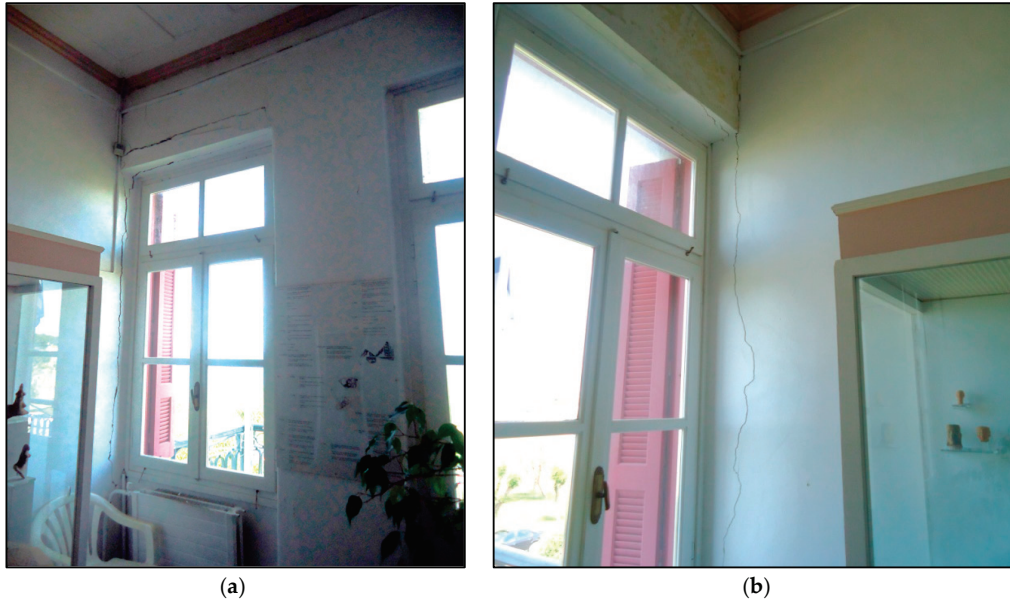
Cracks on the spandrel (a) and at the junction of the external masonry and transverse internal timber wall on the second floor (a,b), caused by the 2014 earthquake (Source: Digital archive of the Ephorate of Antiquities of Lesvos (Hellenic Ministry of Culture and Sports), used with permission (Prot. No. 252765/16-06-2025)).
